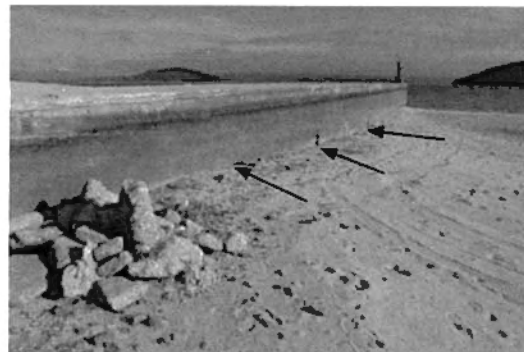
View east along southside of Lady Liberty pier. Erosion clearly visible (cf. Photo 10 which shows accumulation of sands along the north wall of pier). Undermined areas shown by arrows.
